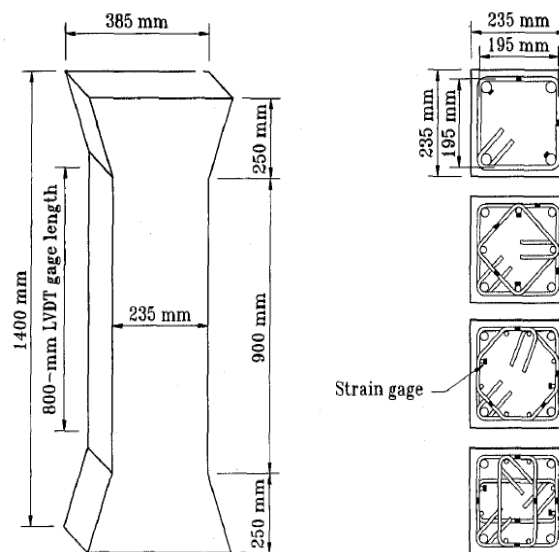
Details of test specimens (Cusson and Paultre 1994)
